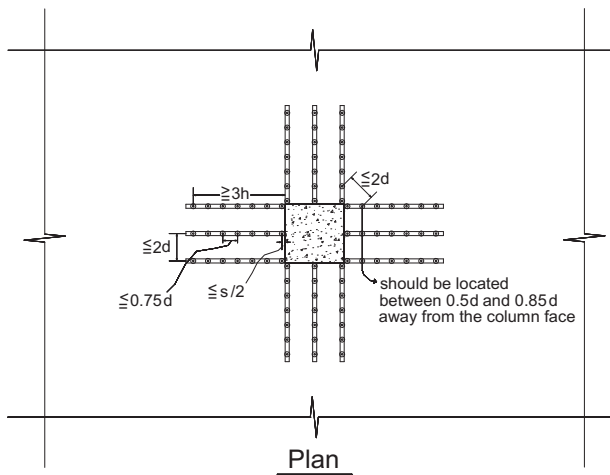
Shear reinforcement details for earthquake-resistant design (scaled)
